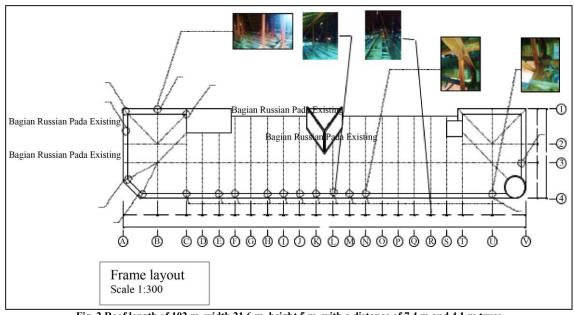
Roof length of 102 m, width 21.6 m, height 5 m, with a distance of 7.4 m and 4.1 m truss
